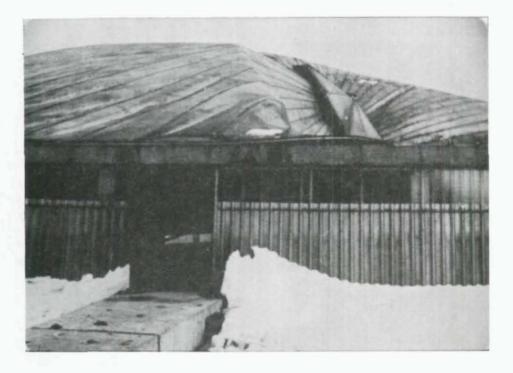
View of water tank cover at Bradford, England, after failure under exceptional snow load
